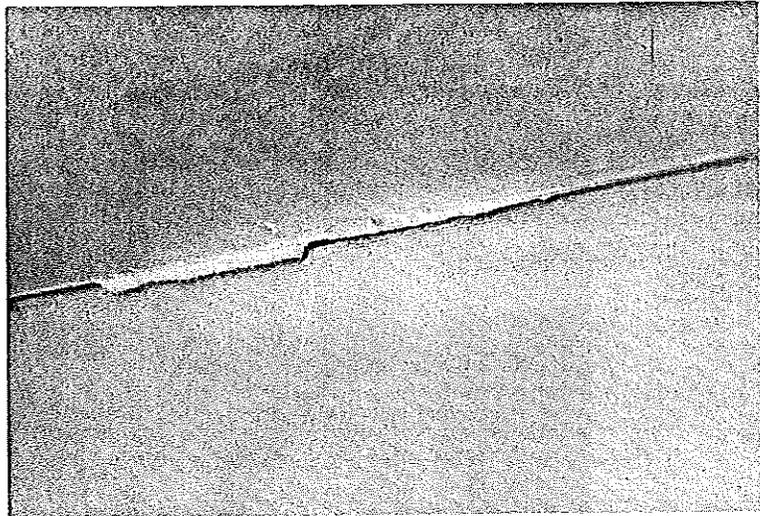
Interior plaster cracking and spalling at a door frame.
